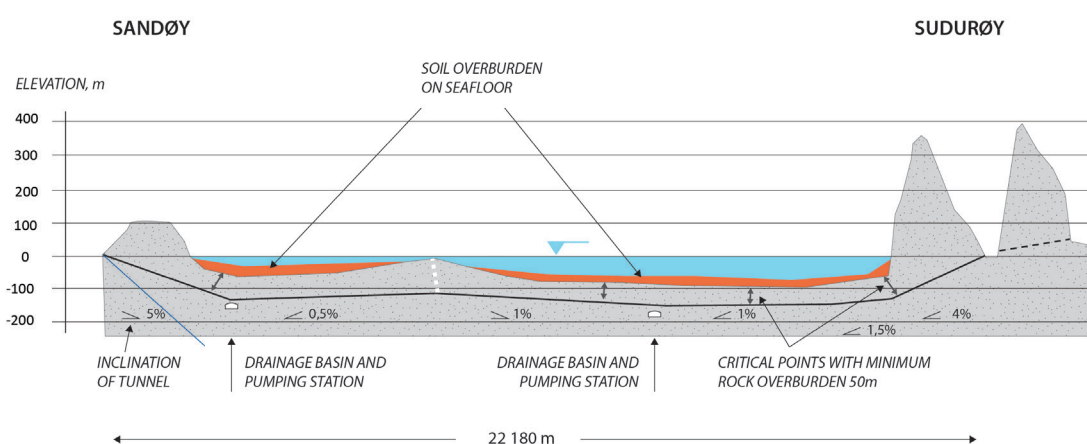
Tunnel alignment option 3 with one long tunnel passing East of Skugvøy with possibility for ventilation tunnel. Longitudinal section.
